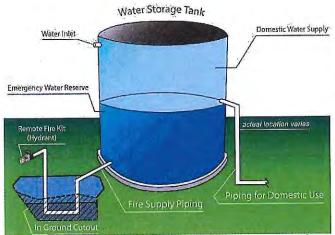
Typical layout of steel water tank for fire and domestic supply
